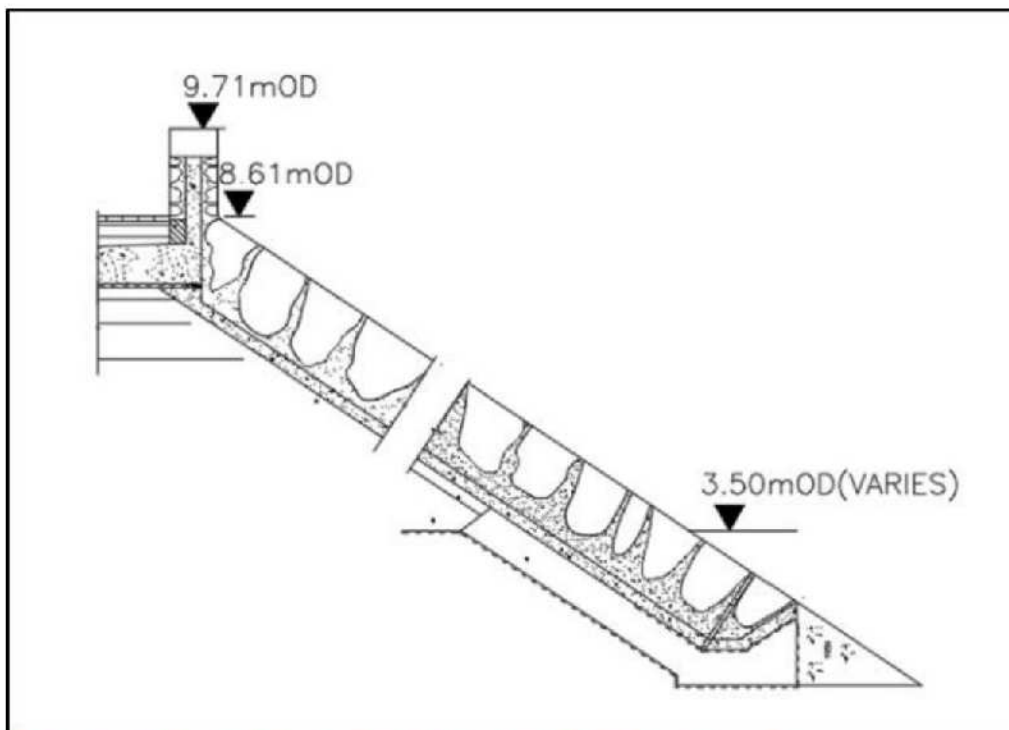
Section-3 (Granite Talus) – Typical Structural Details (not to scale).
